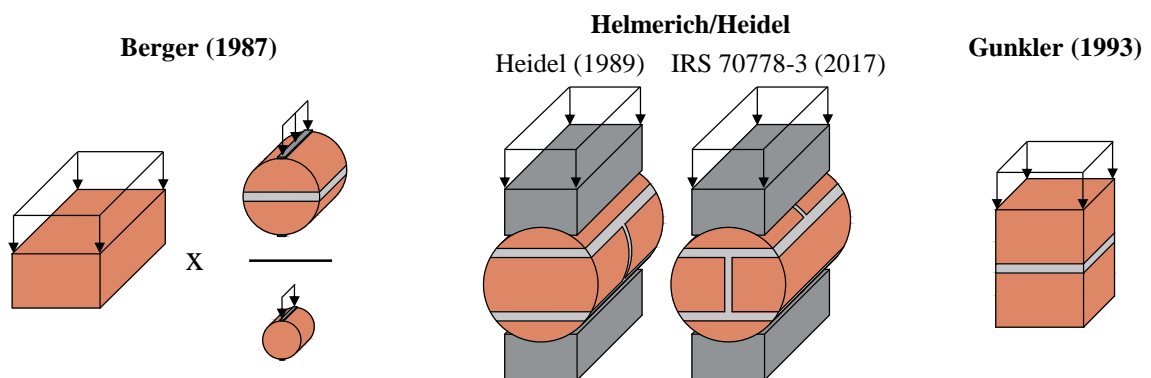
Alternative procedures for testing masonry compressive strength on composite specimens extracted from existing masonry
